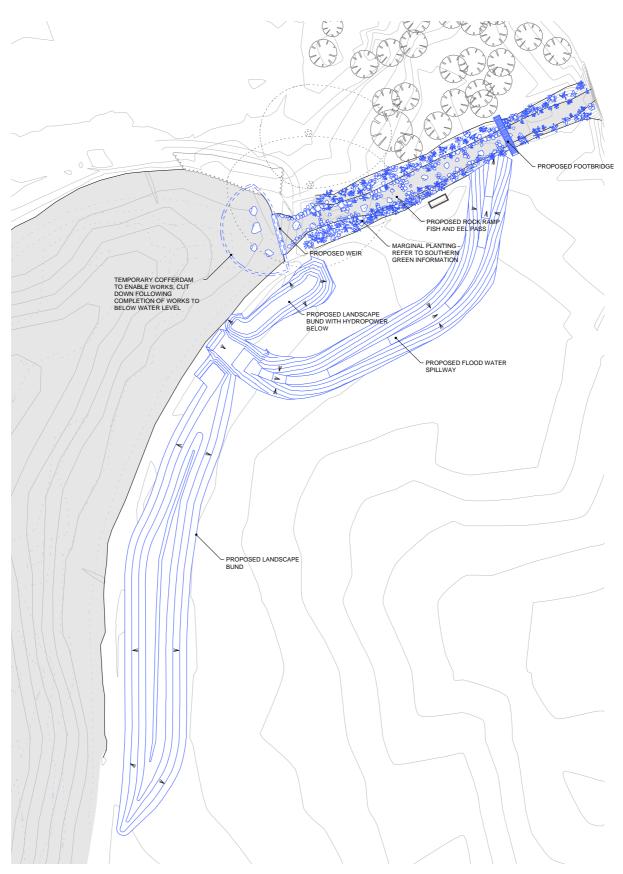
Proposed site plan indicating the design elements discussed in this report: weir; rock ramp fish and eel pass; landscape bunds and spillway; footbridge (NTS)
